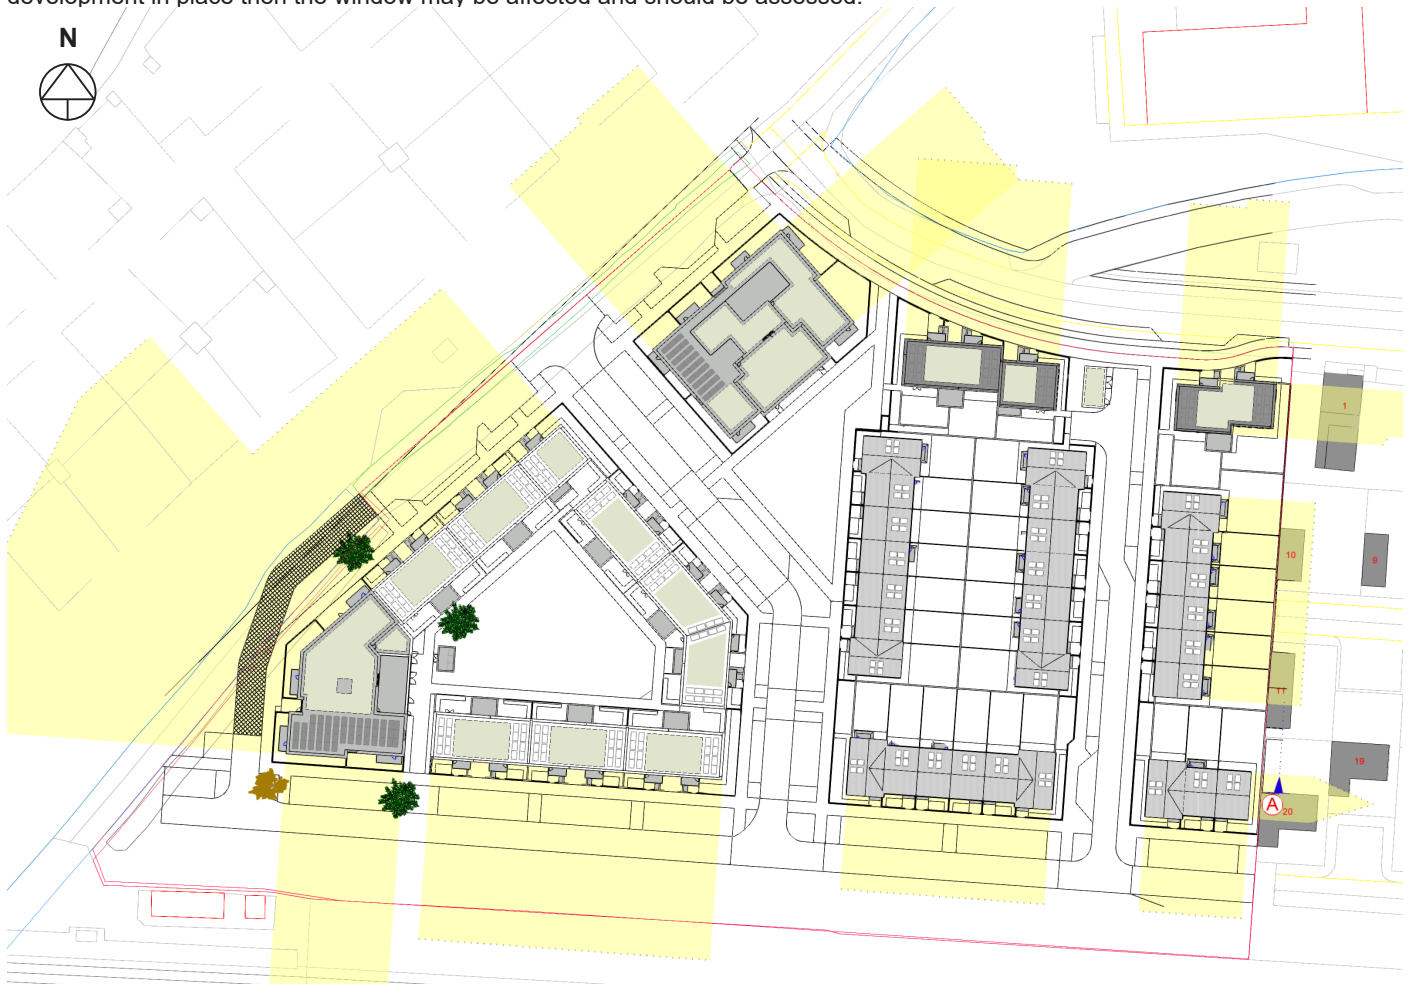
Proposed site plan showing the zone of influence (3 times the height of the proposed building) and direction of the window wall of adjacent residential properties.
